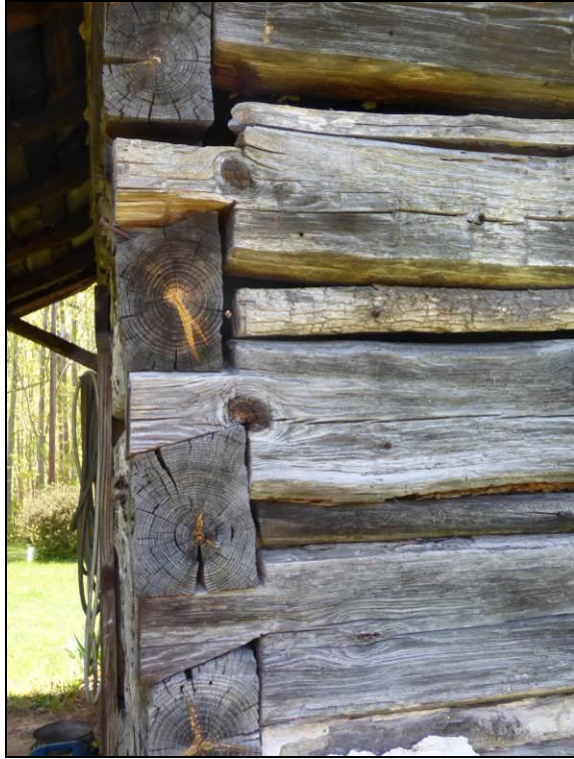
Half-Dovetail Notching at the Corners of the Building.
